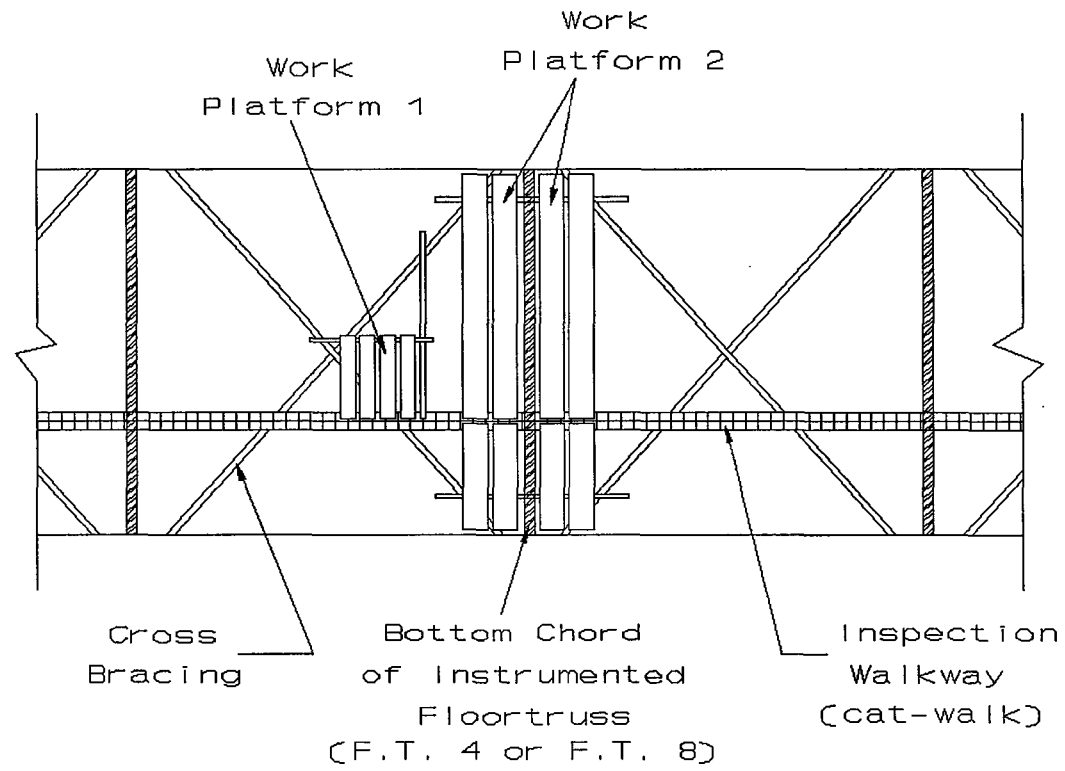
Plan View of Work Platforms at Floortruss Test Location
